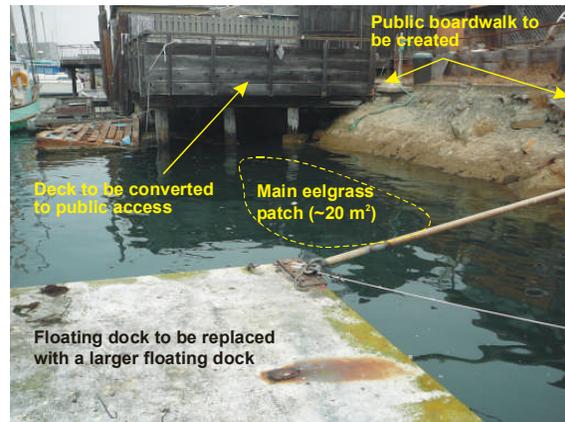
View looking north of deck and dock to be modified and where a portion of the public boardwalk will be installed.
